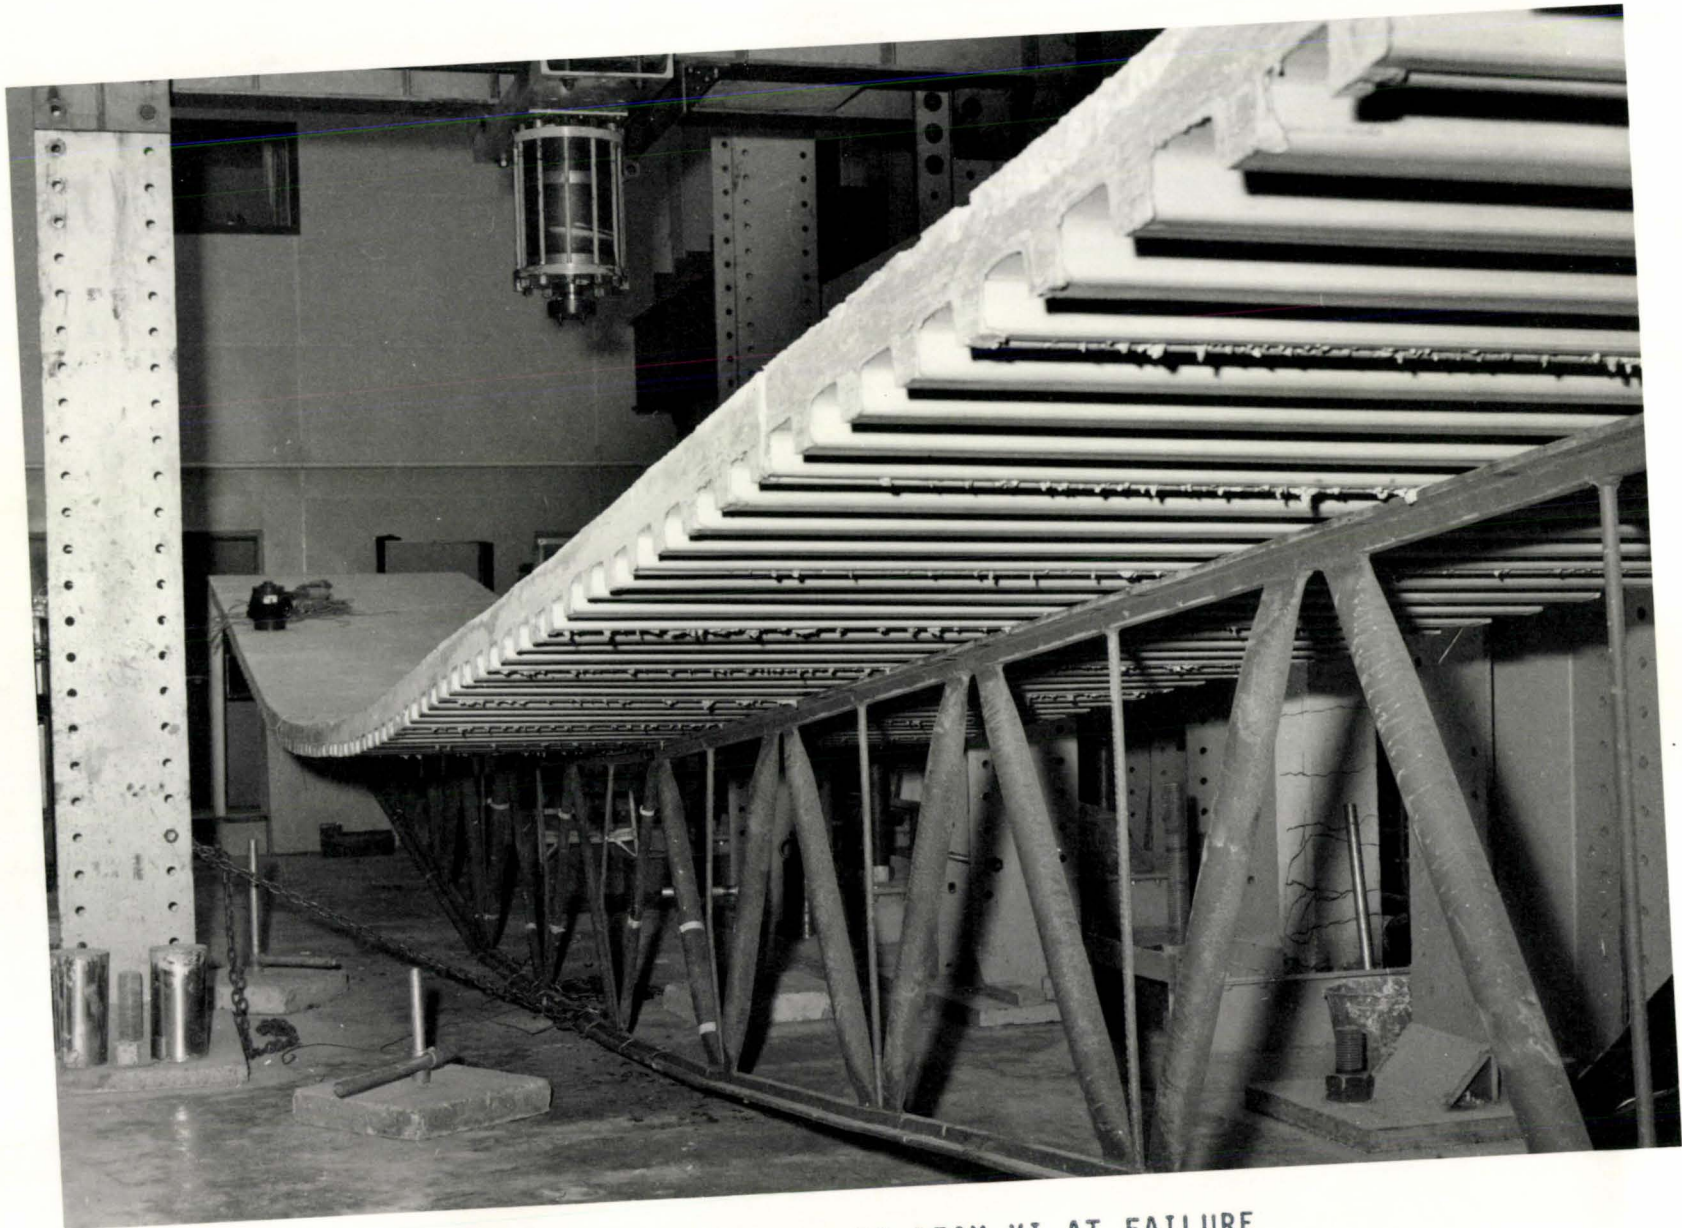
DEFLECTION OF BEAM VI AT FAILURE
